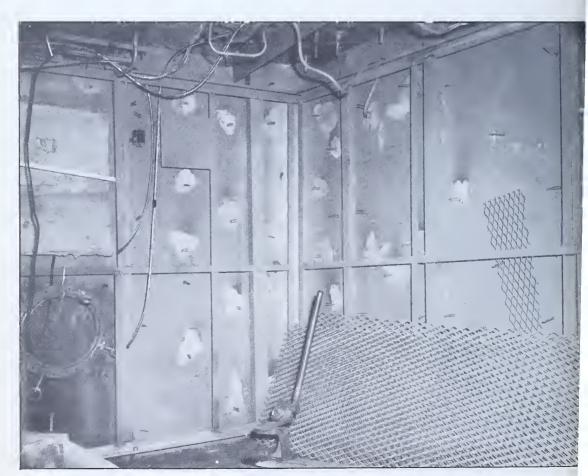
Layout for Insulation Pins (Pins are welded in place)
